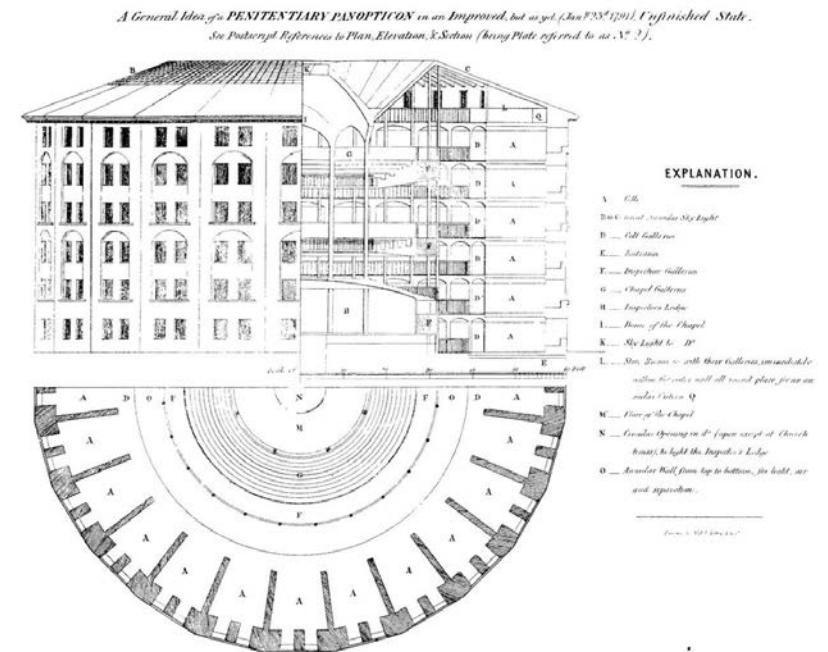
Elevation, section and plan of Jeremy Bentham's Panopticon penitentiary, 1791, Drawn by Willey Reveley
